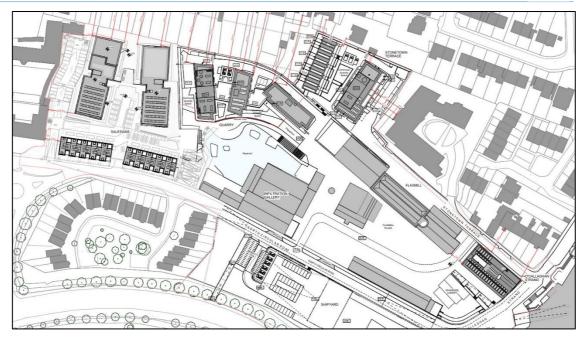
Extract from drawing no. CRQMP-FCBS-ZZ-02-DR-AA-0115 'Proposed Site Layout Plan' showing the layout of the proposed buildings and locations of the proposed panels.
